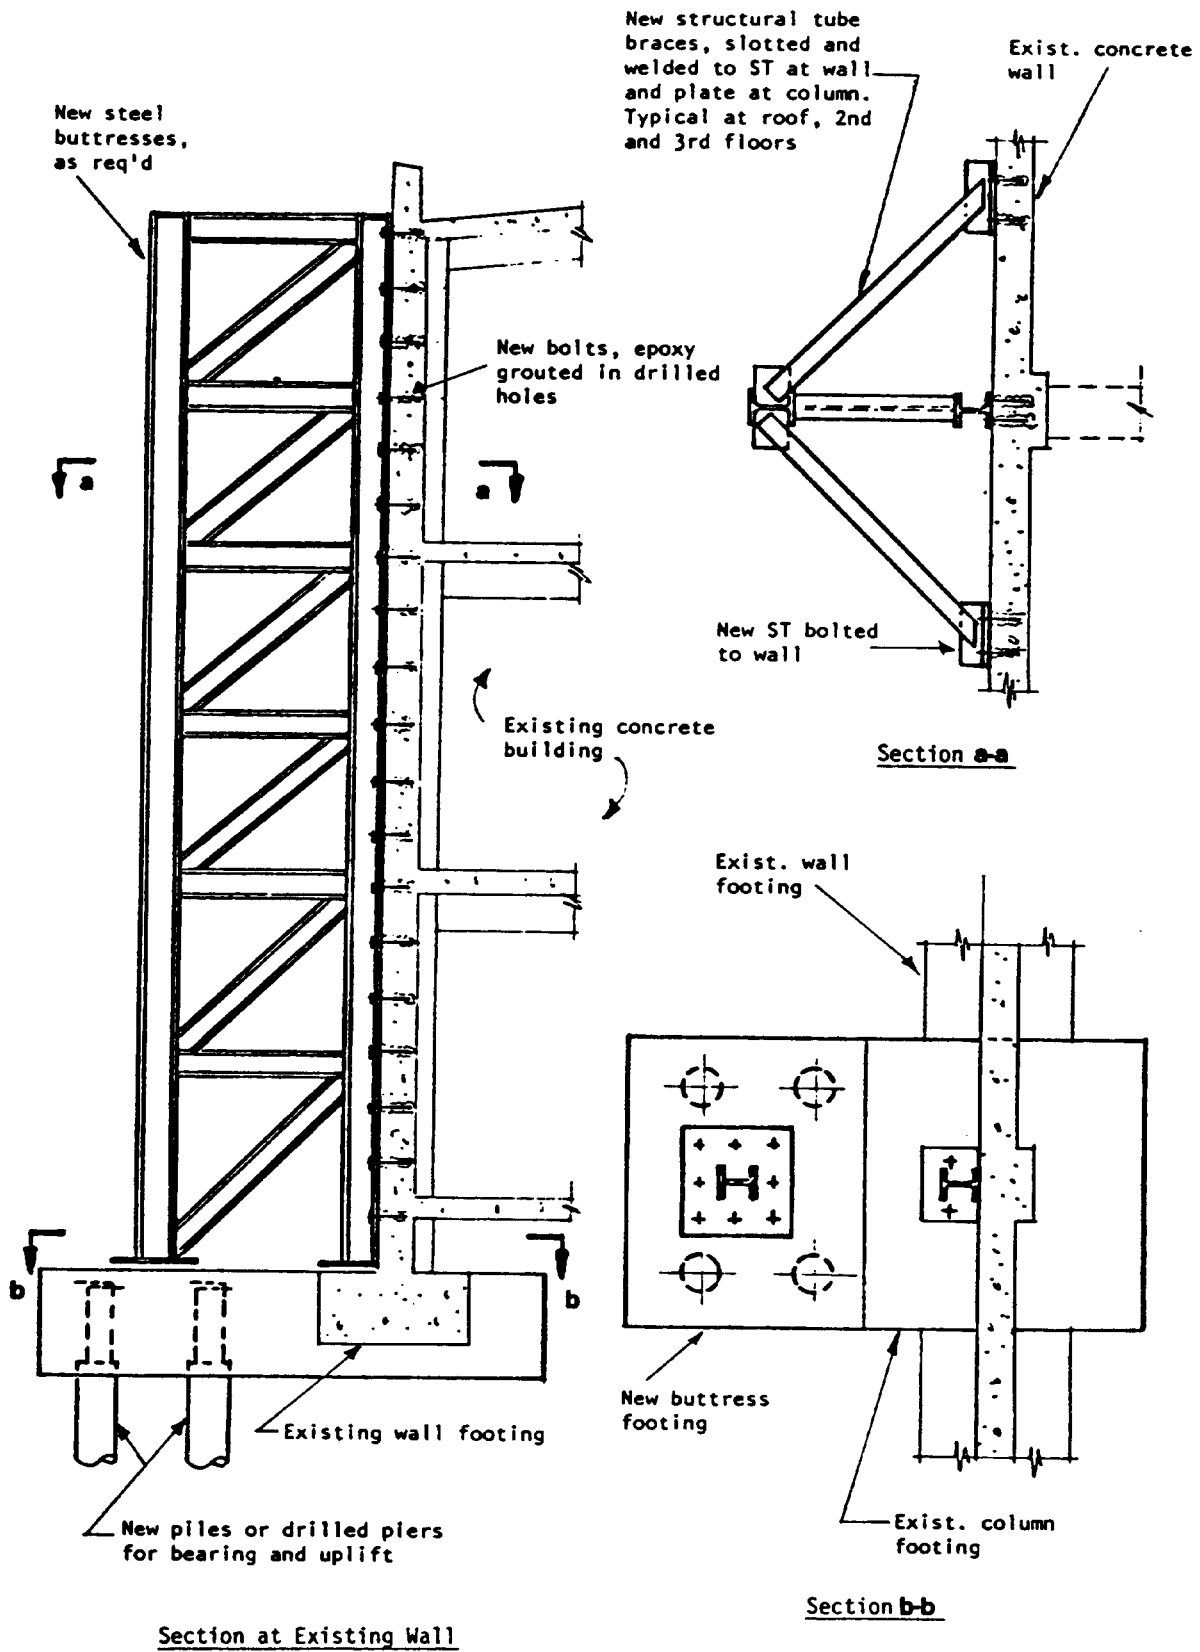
Braced structural steel buttresses to strengthen an existing reinforced concrete building
